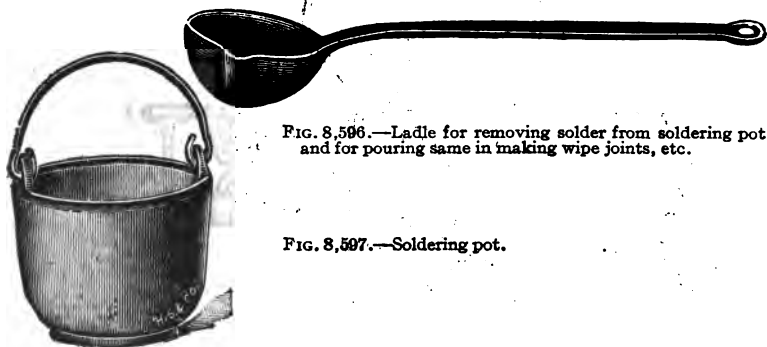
,596.—Ladle for removing solder from soldering pot and for pouring same in making wipe joints, etc.
